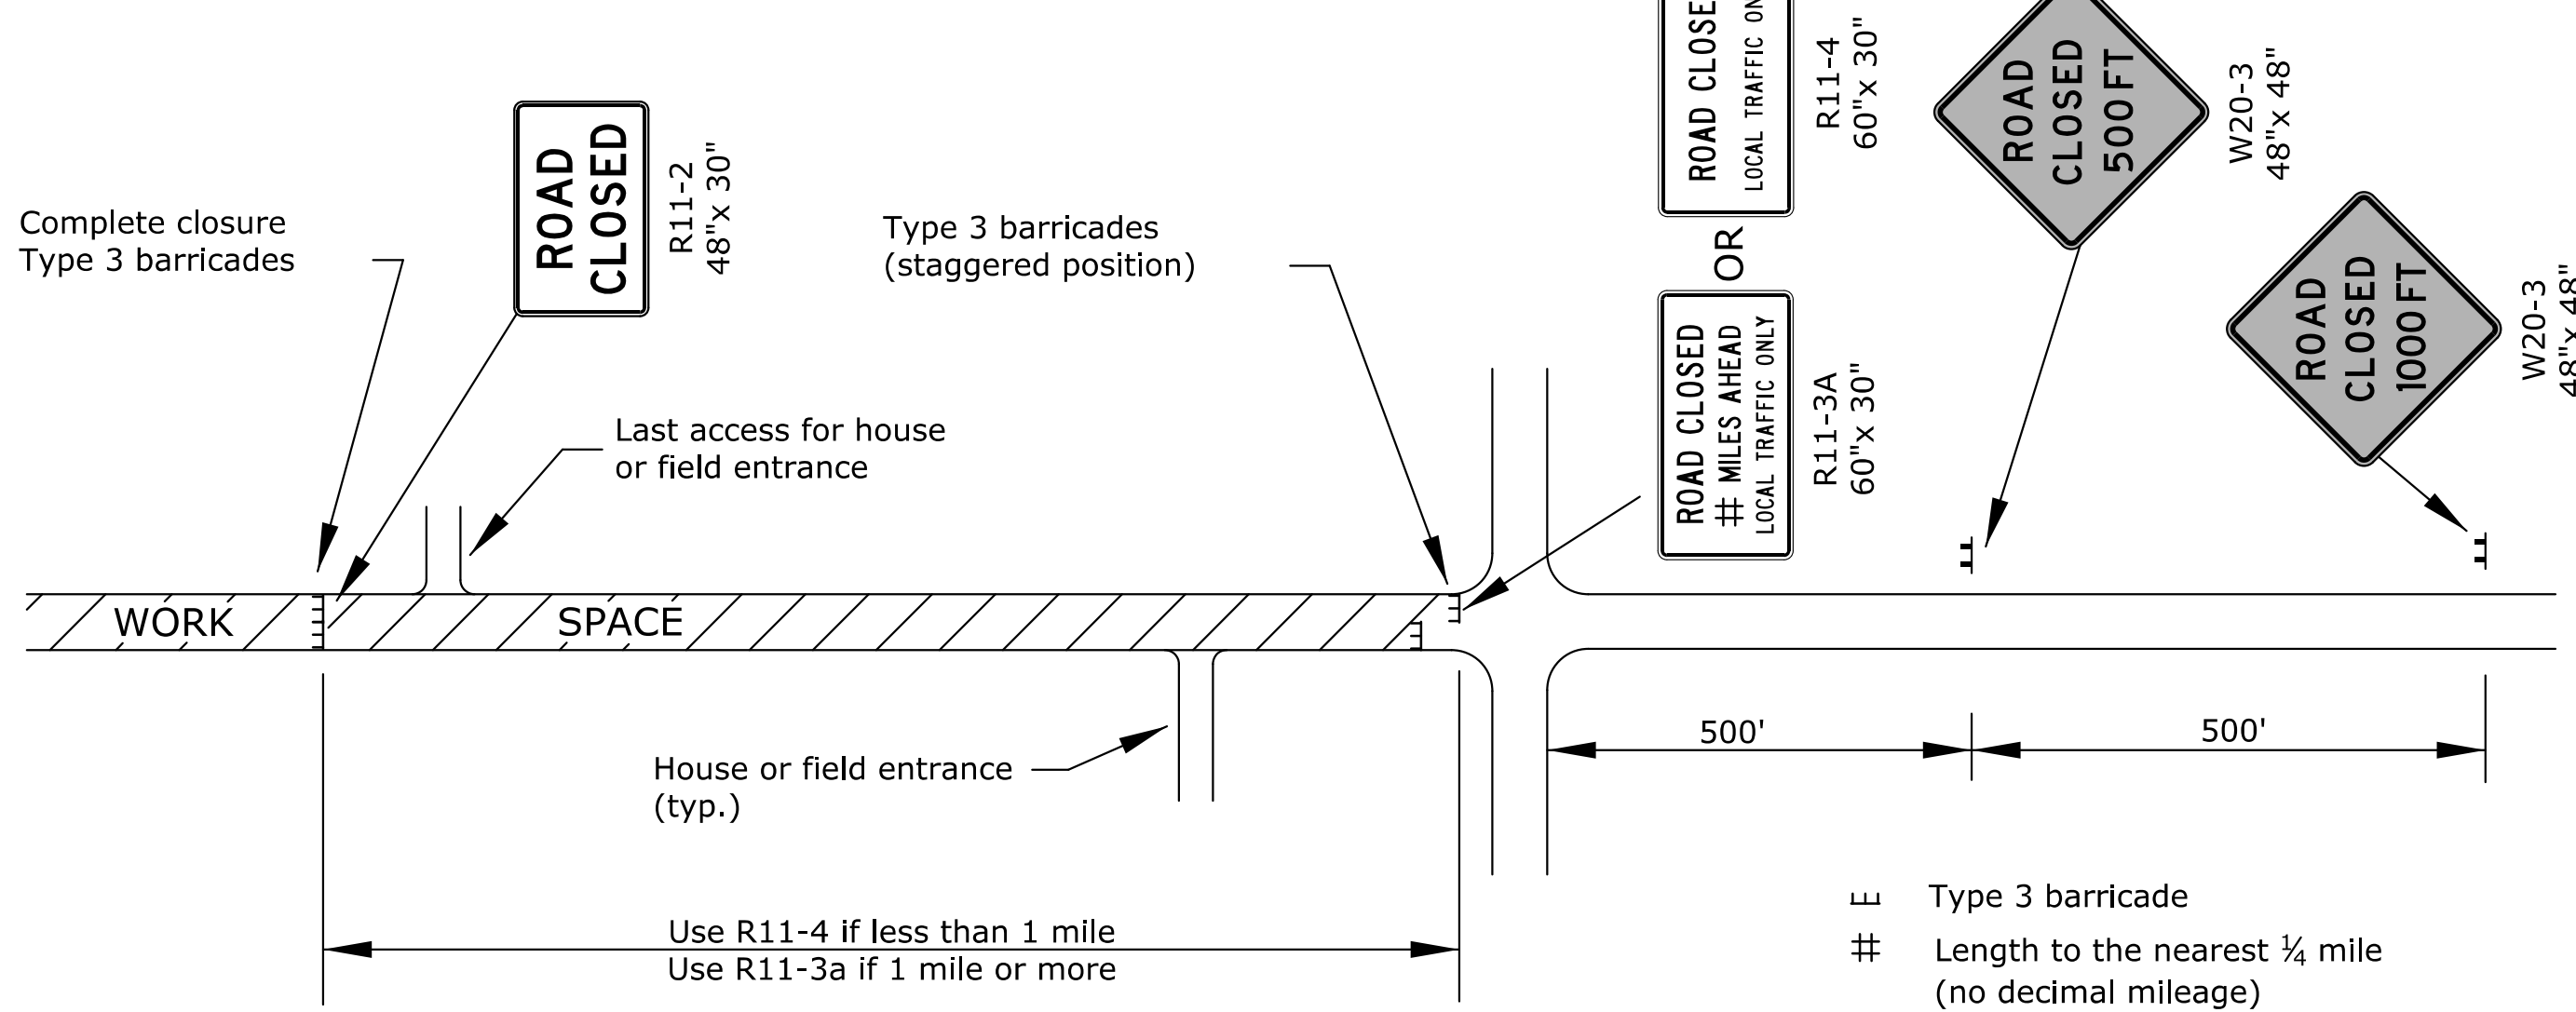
TYPICAL SIGNING FOR ROAD CLOSURE - LOCAL TRAFFIC ACCESS
